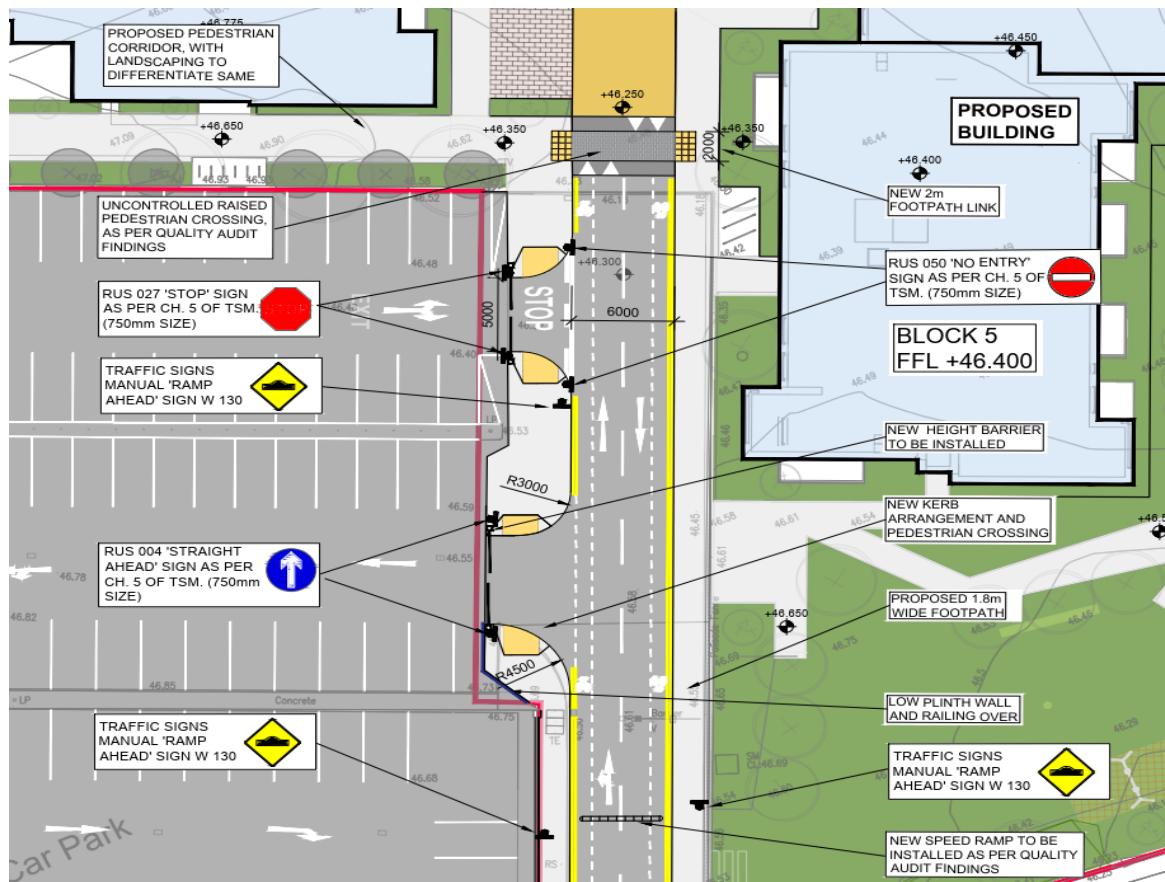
Site Entrance Arrangement (See CST-BMD-00-ZZ-DR-C-1017 for further details)
